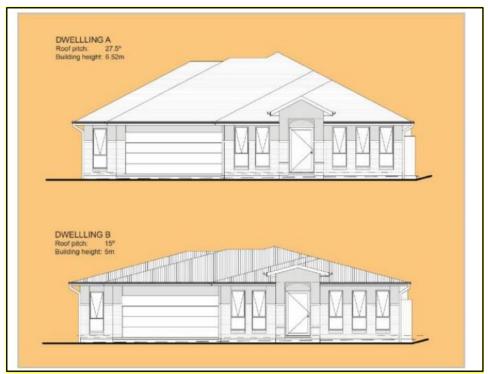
Dwelling roof forms, 15 degree and 27.5 degree roof pitches
